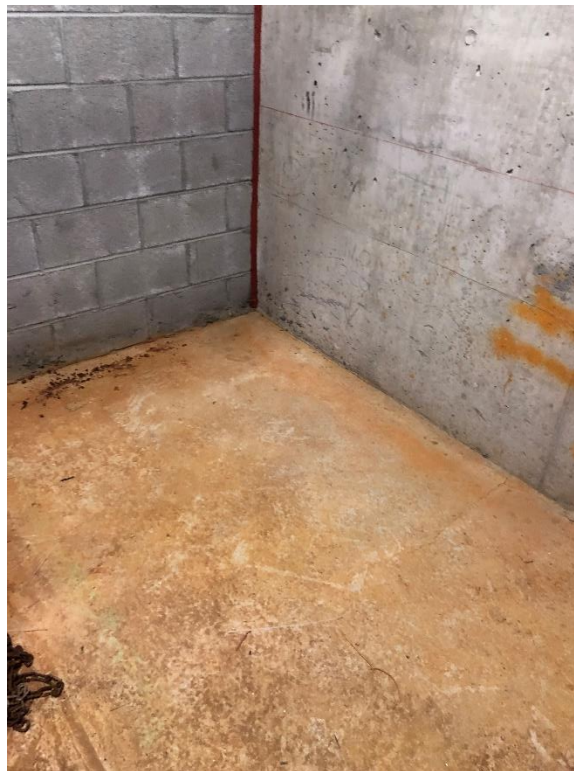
View of foundation slab in sub-cellar. Dated 12/20/2019.
